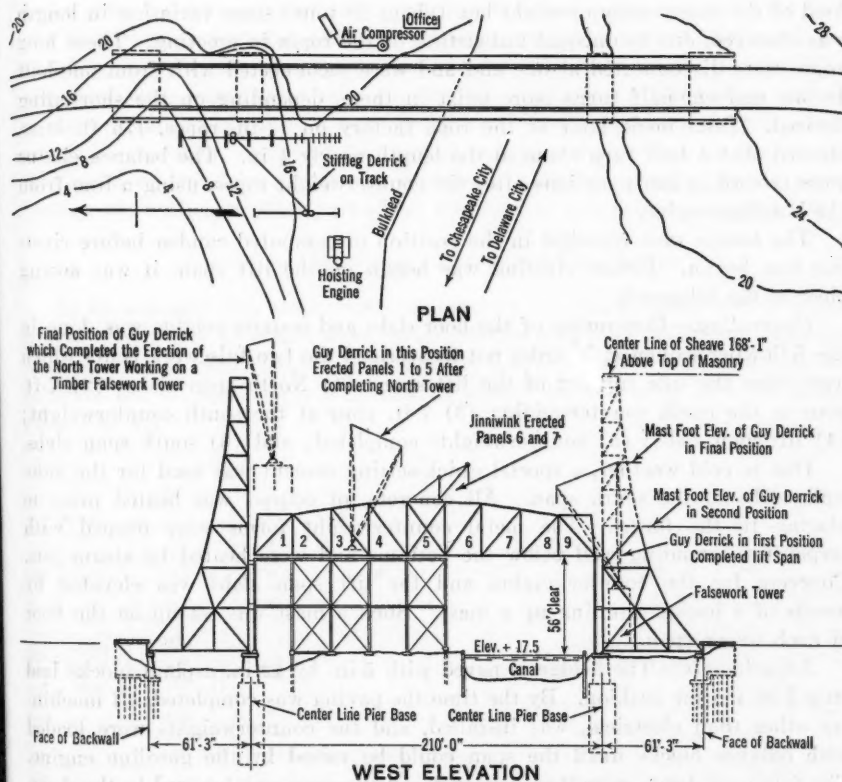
JOB LAYOUT, ST. GEORGES BRIDGE SUPERSTRUCTURE.
